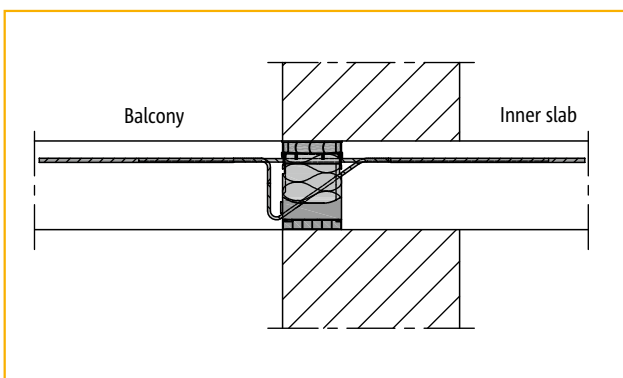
Single-leaf brickwork with a balcony at inner slab level
